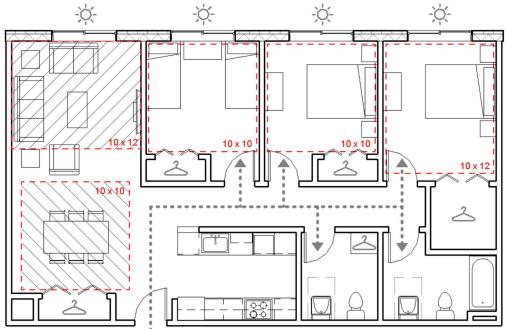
Typical three-bedroom unit. Image is courtesy of DHCD's Massachusetts Multifamily New Construction Design Requirements.
